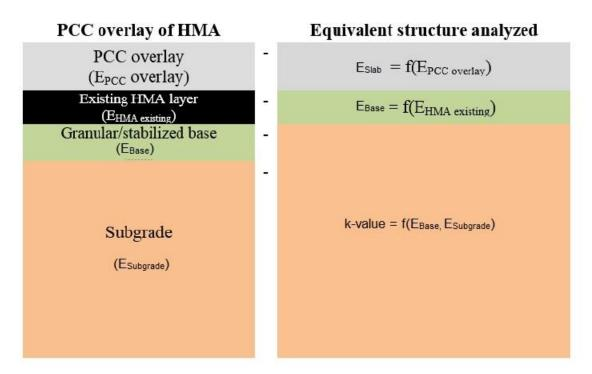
Diagram. Transforming the actual pavement structure into an equivalent structure for a PCC overlay of an existing HMA pavement.
